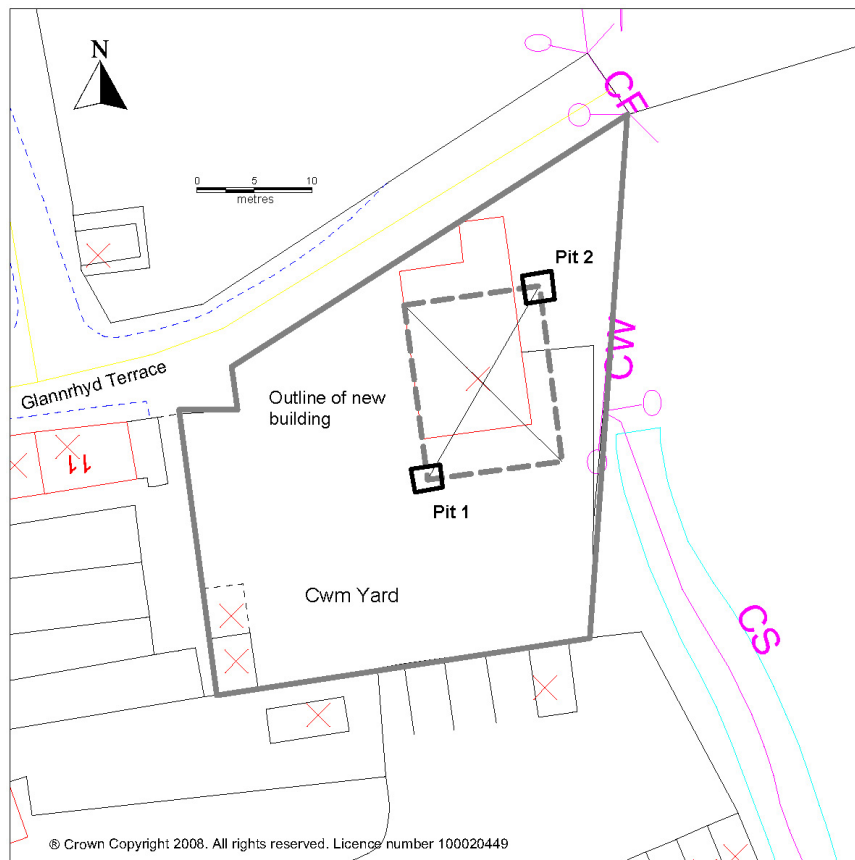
Cwm yard site plan, showing location of proposed building and of the pits referred to above.
